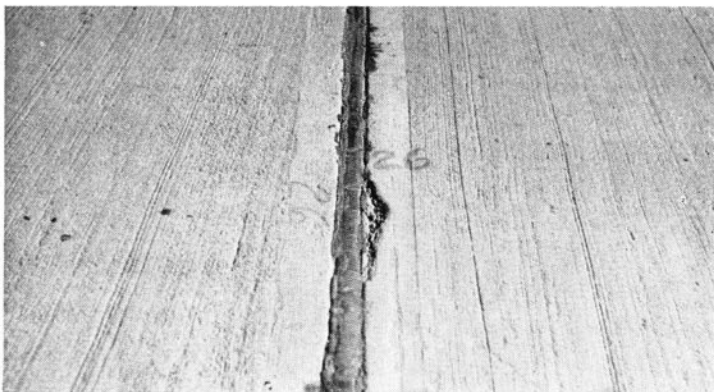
(AT TOP). SLIGHT SPALLING
